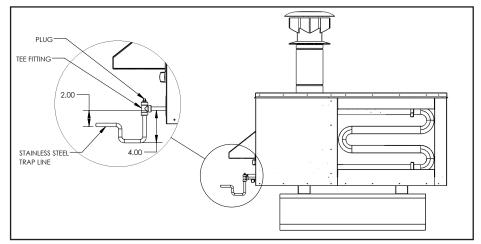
RECOMMENDED DRAIN TRAP CONSTRUCTION
